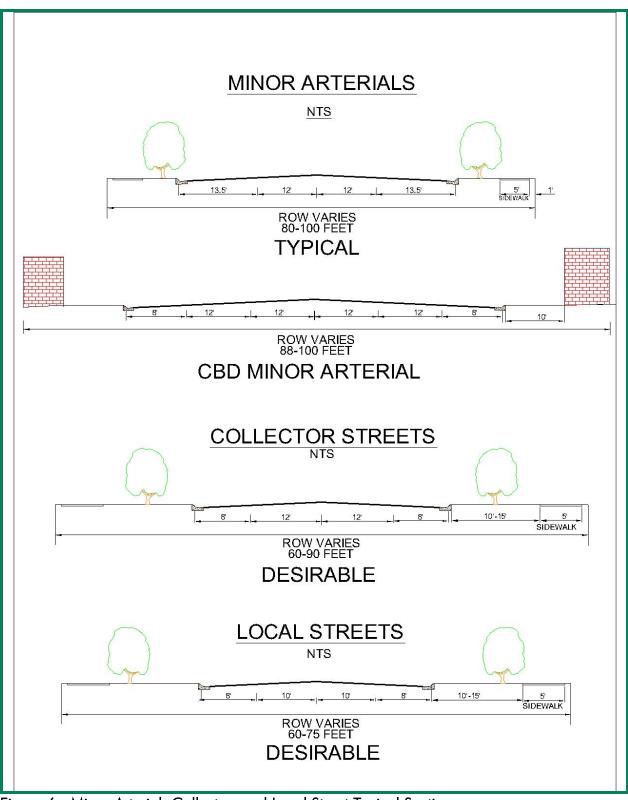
Minor Arterial, Collector, and Local Street Typical Sections
